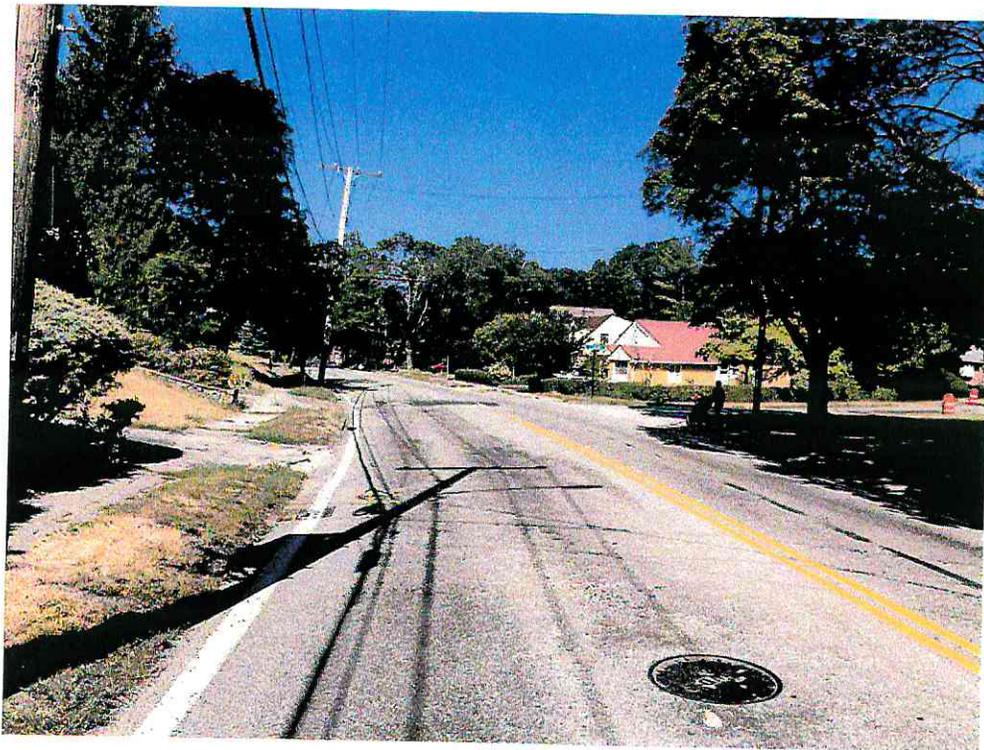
Location c – Cross St. looking west. 150' west of Cleveland St.
